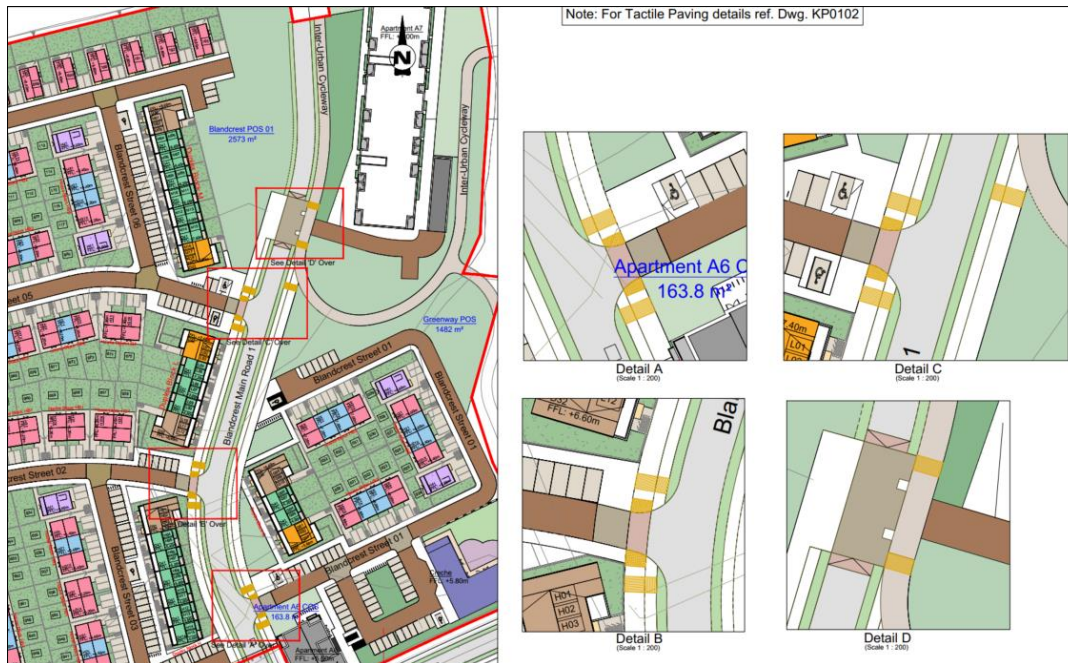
Extract from Proposed Site Layout Plan for Inter Urban Cycleway
